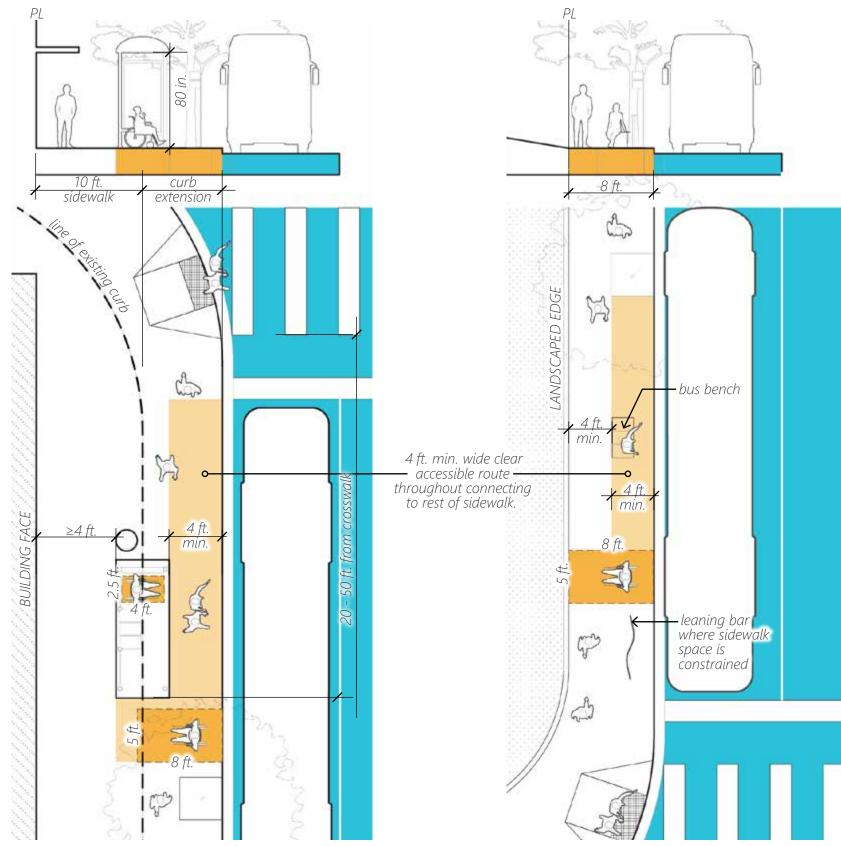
Far Side, In-Lane Loading Bus Stop at a 10 ft. Wide Sidewalk with Curb Extension, along a Retail Street.
